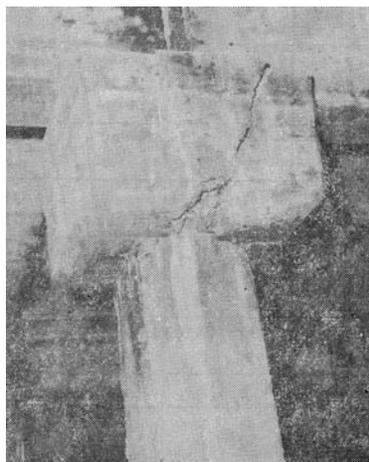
The pile cap of a vertical pile under the rear platform broke at the No. 9 berth at the New Port of Tianjin.
